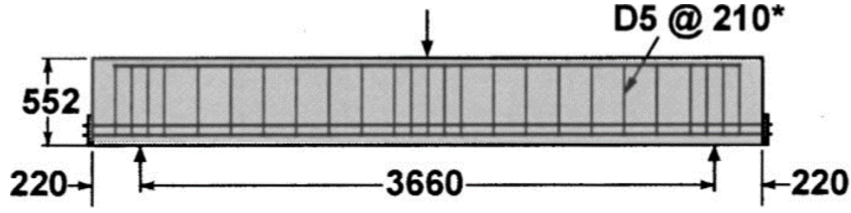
Geometry and reinforcement details of the beam A1 (from Vecchio and Shim (2004))
